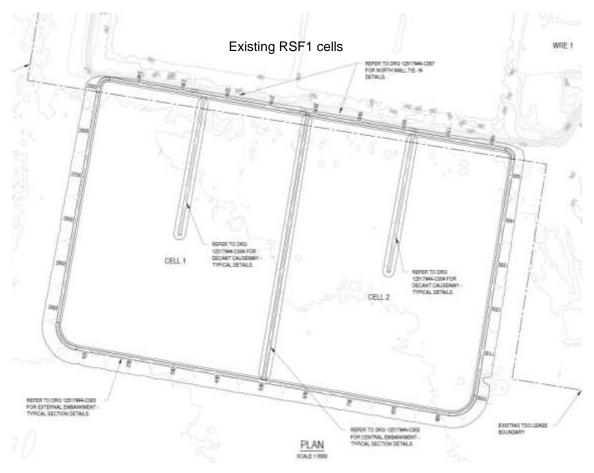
Preferred Site Arrangement – Stage 2 Plan
